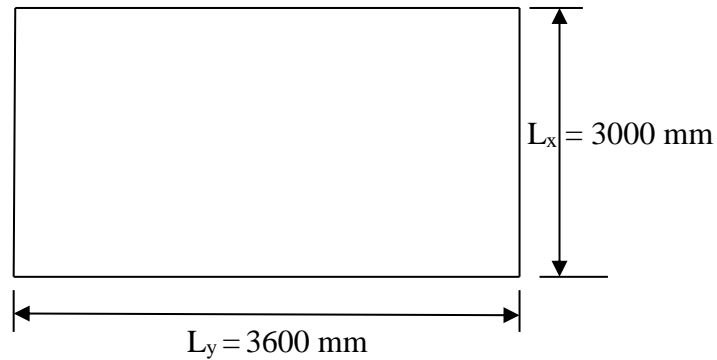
Interior solid reinforced concrete floor slab panel
